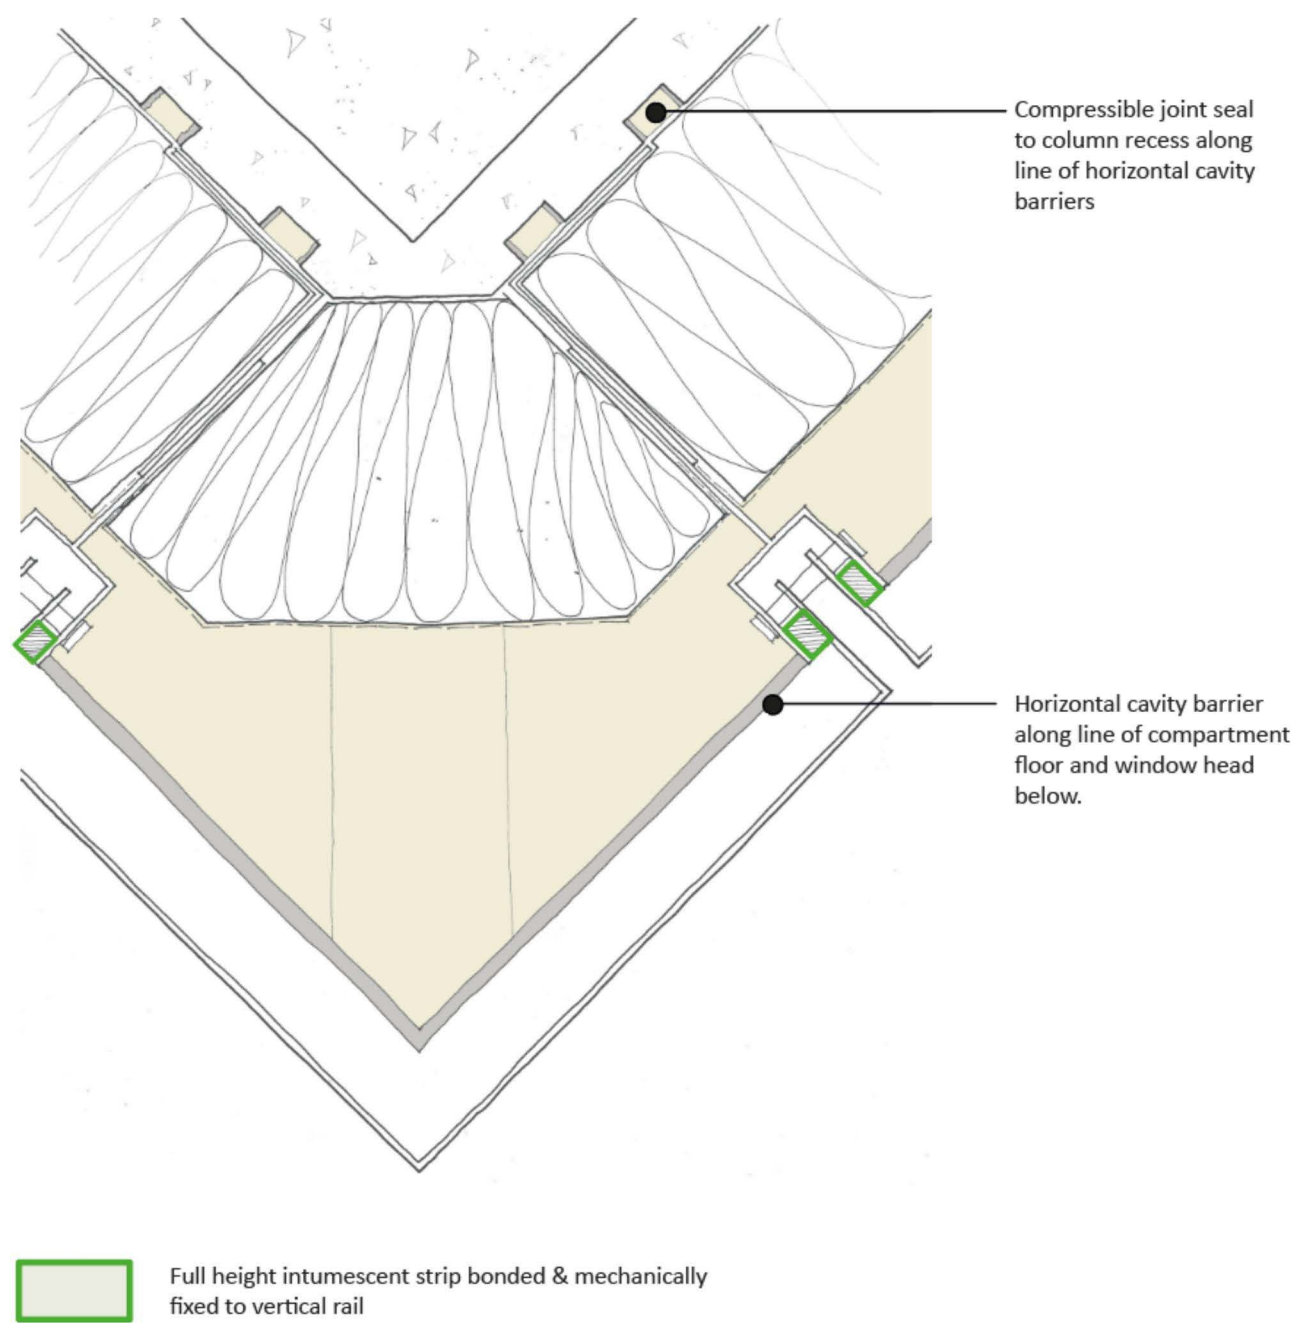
Detail 6 – Plan detail through column ‘nose’ with cavity barrier arrangement highlighted
